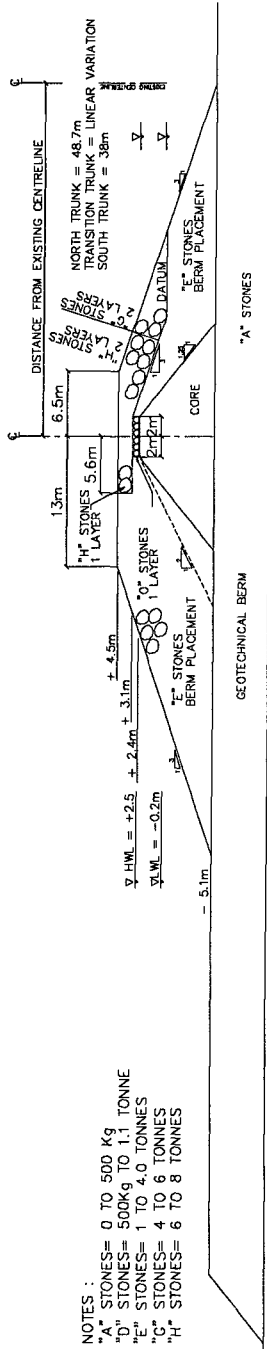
TYPICAL SECTION THROUGH SUPERSTRUCTURE TRUNK
